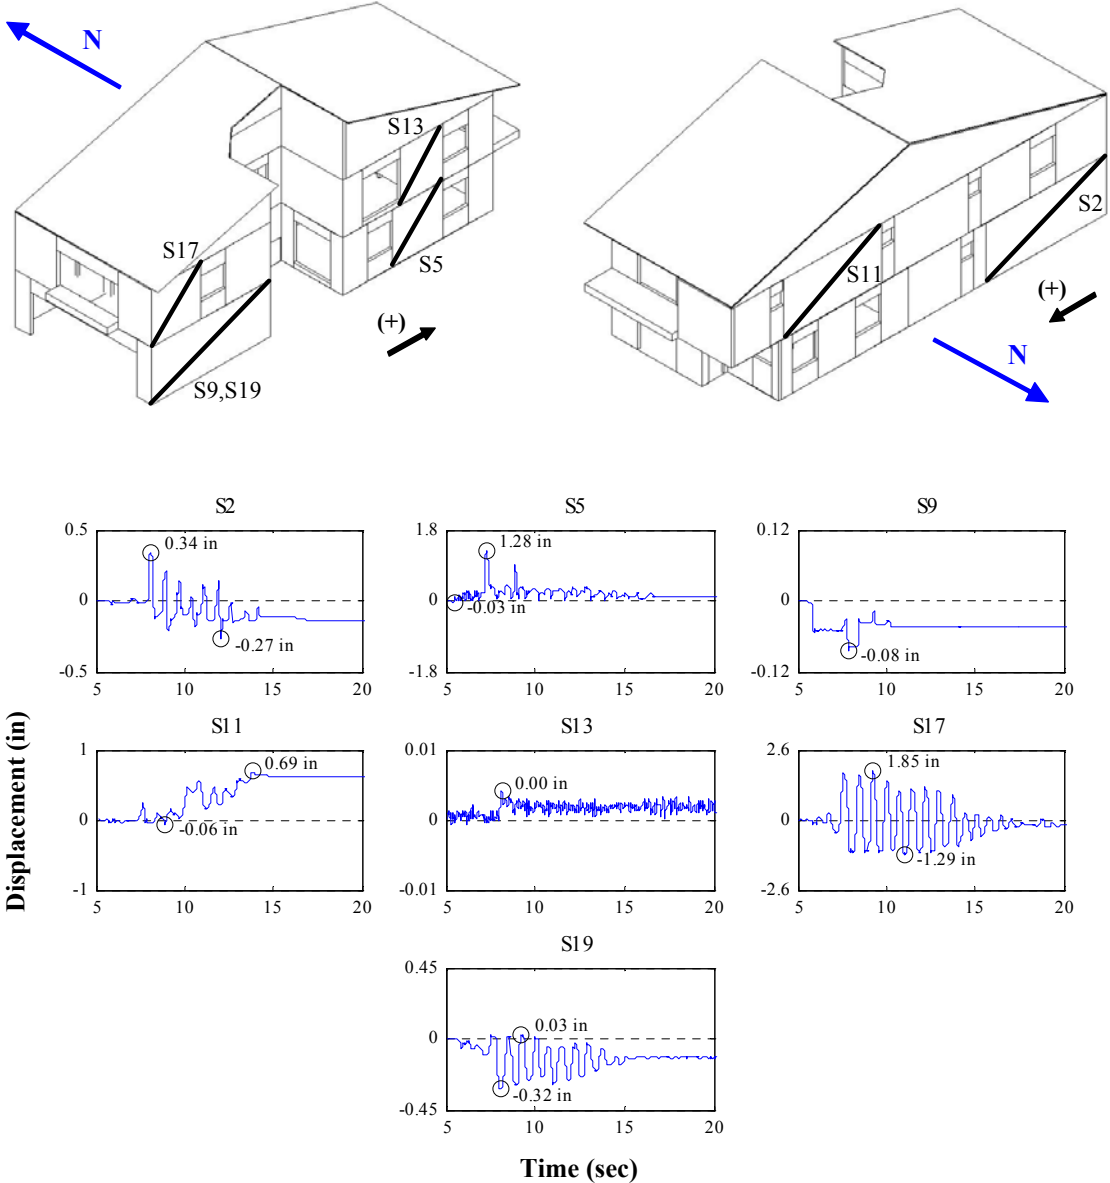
Wall deformations of east-west external walls for Test NWP5S11
